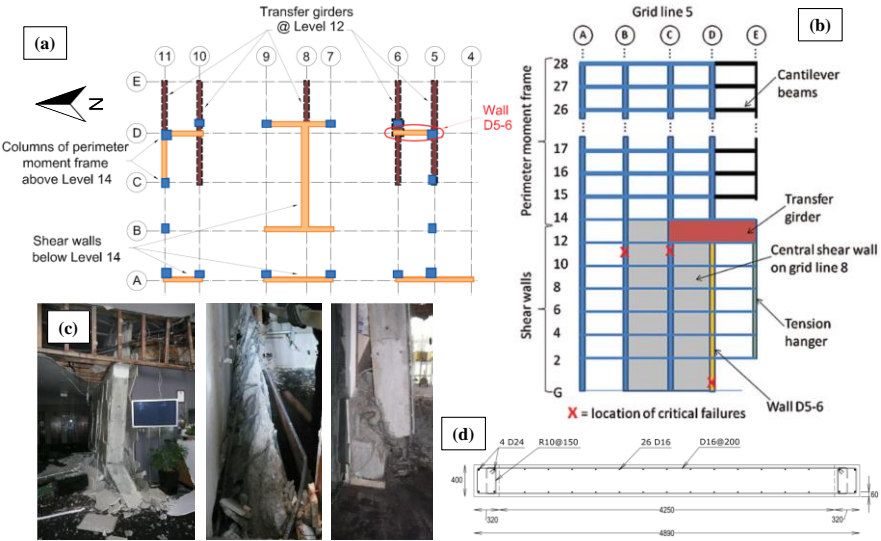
(a & b) Grand Chancellor Hotel structural layout sketch plan and elevation along grid line 5 (Elwood 2013), (c) failure mode of wall D5-6 from GCH building in the 2011 NZ earthquake (Dunning Thornton 2011) and (d) details of the wall D 5-6 (Dunning Thornton 2011)
